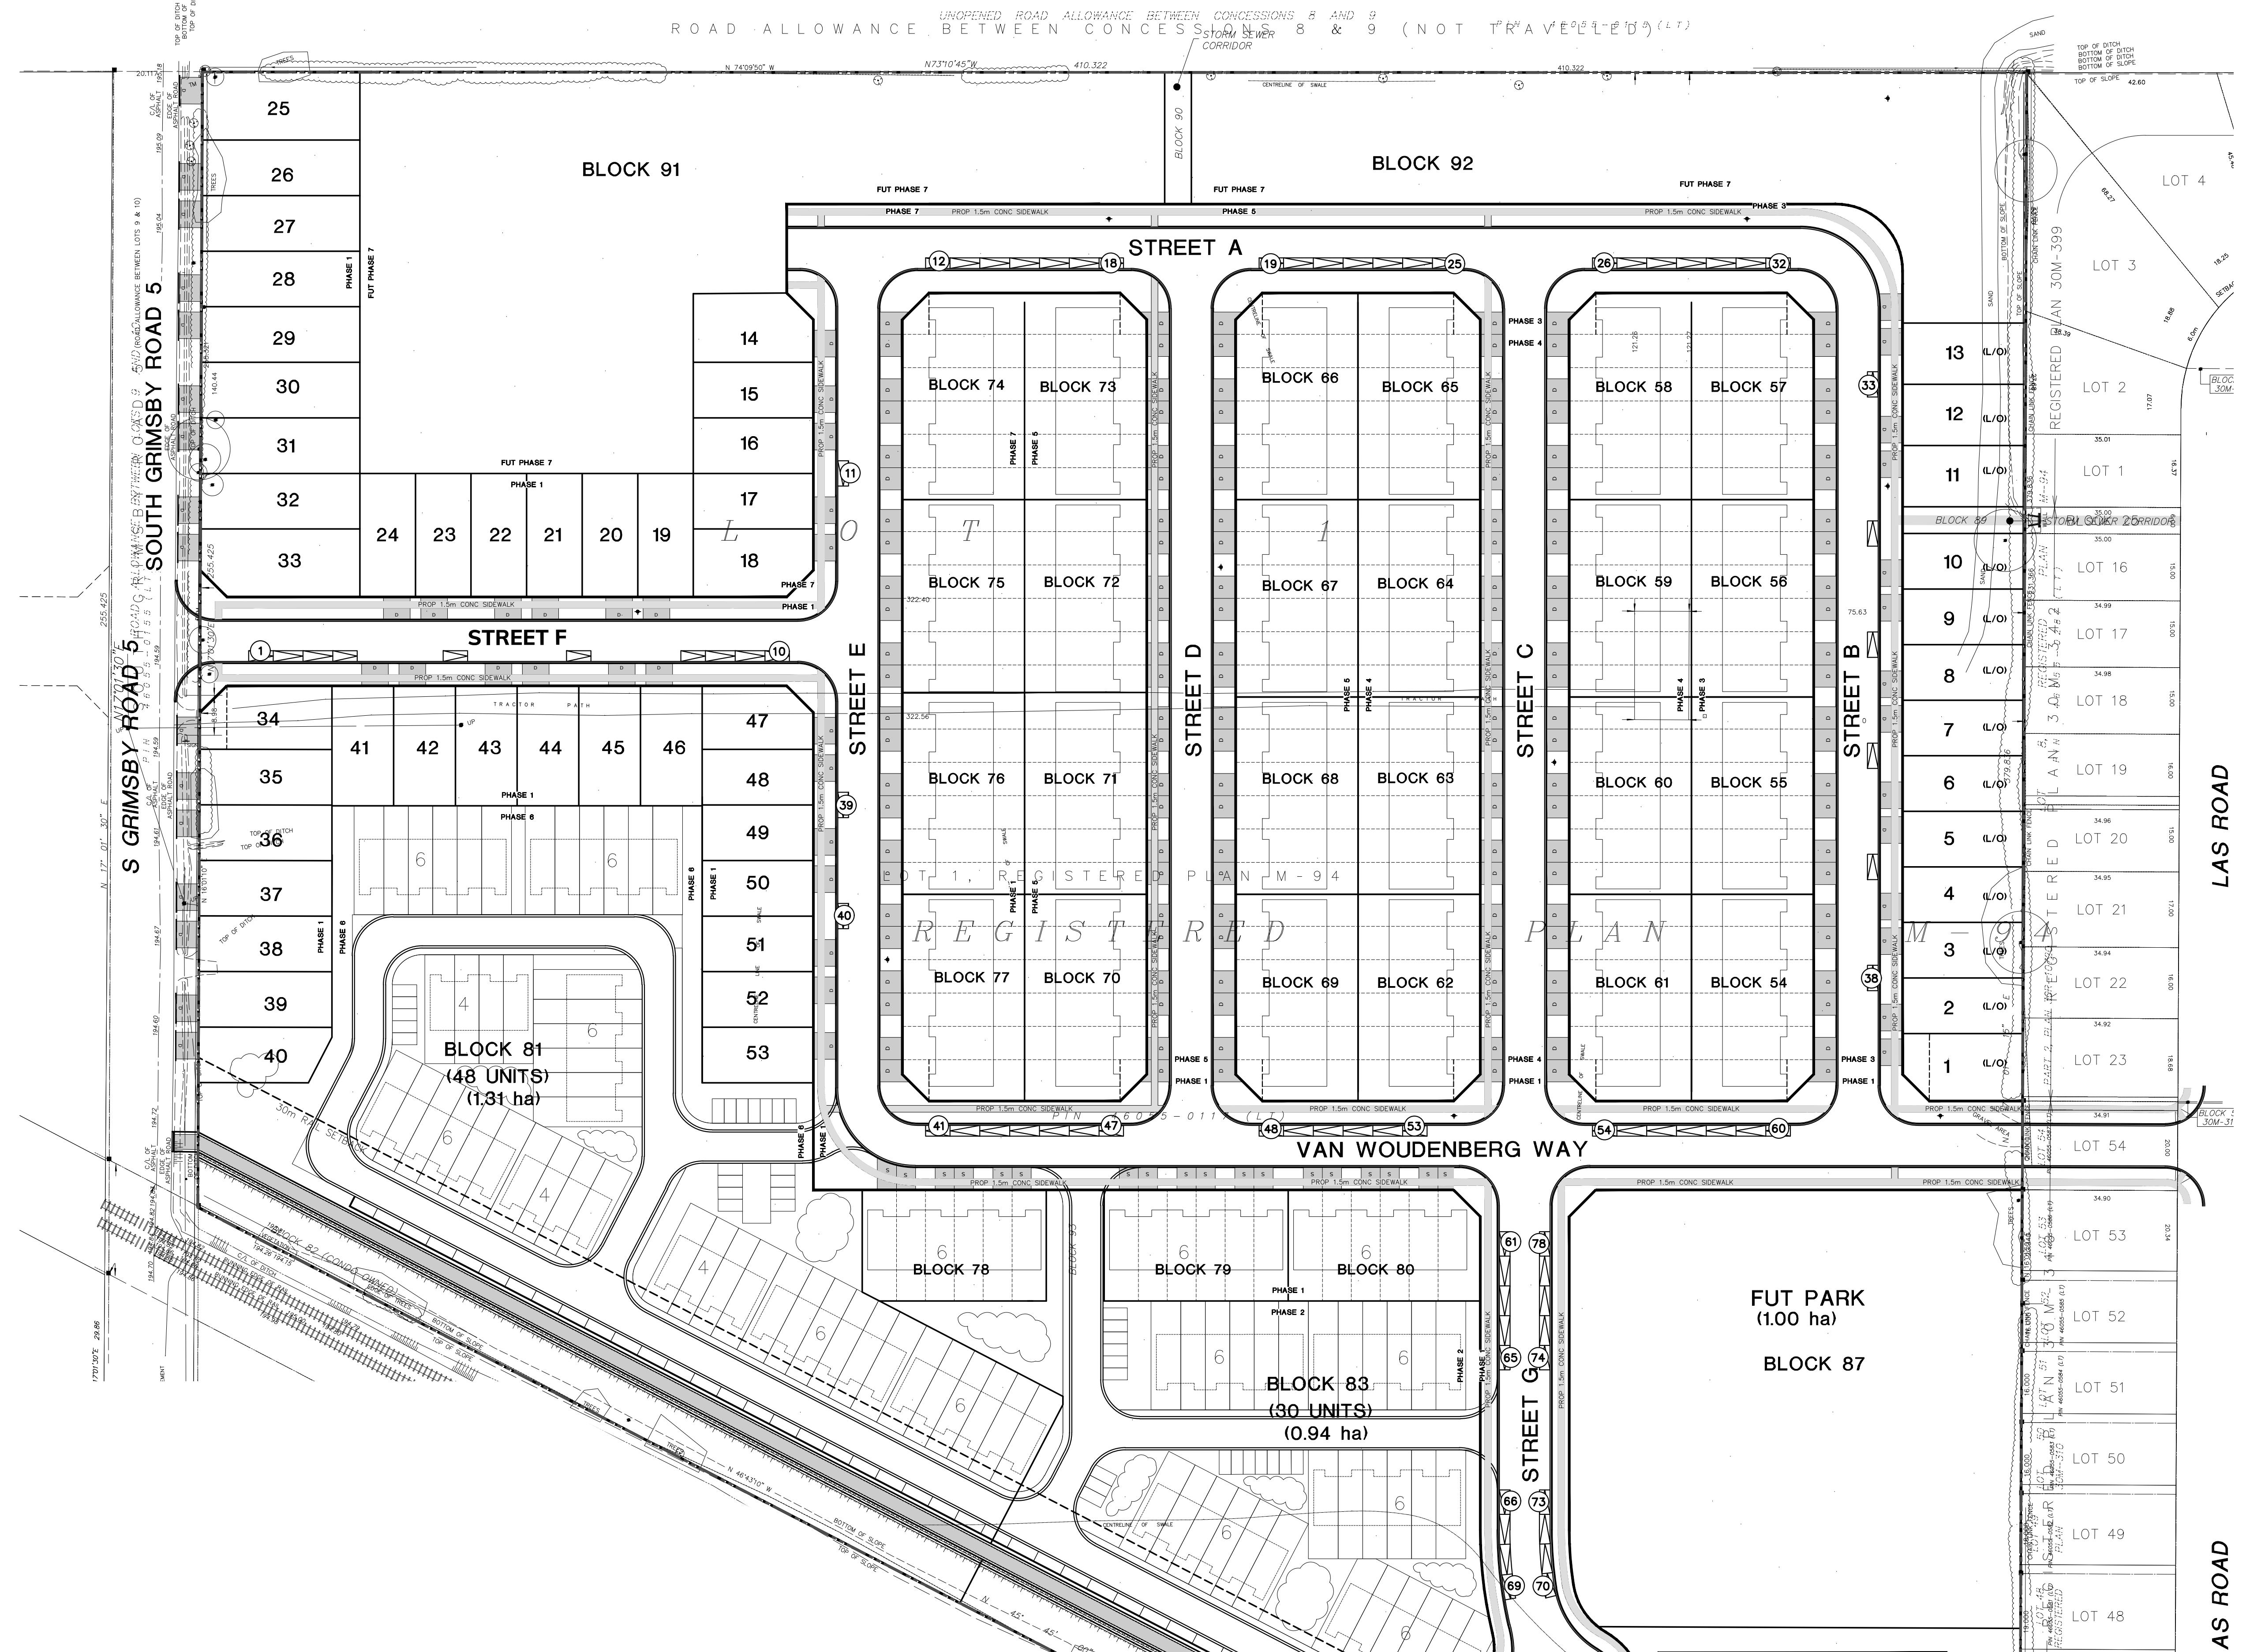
FIGURE : CONCEPTUAL STORM SERVICING LAYOUT PLAN
